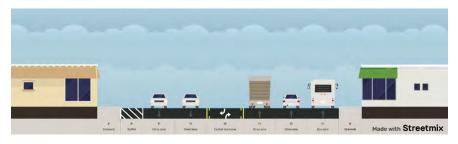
GRAND AVENUE TYPICAL SECTION: 27TH STREET TO 23RD STREET
